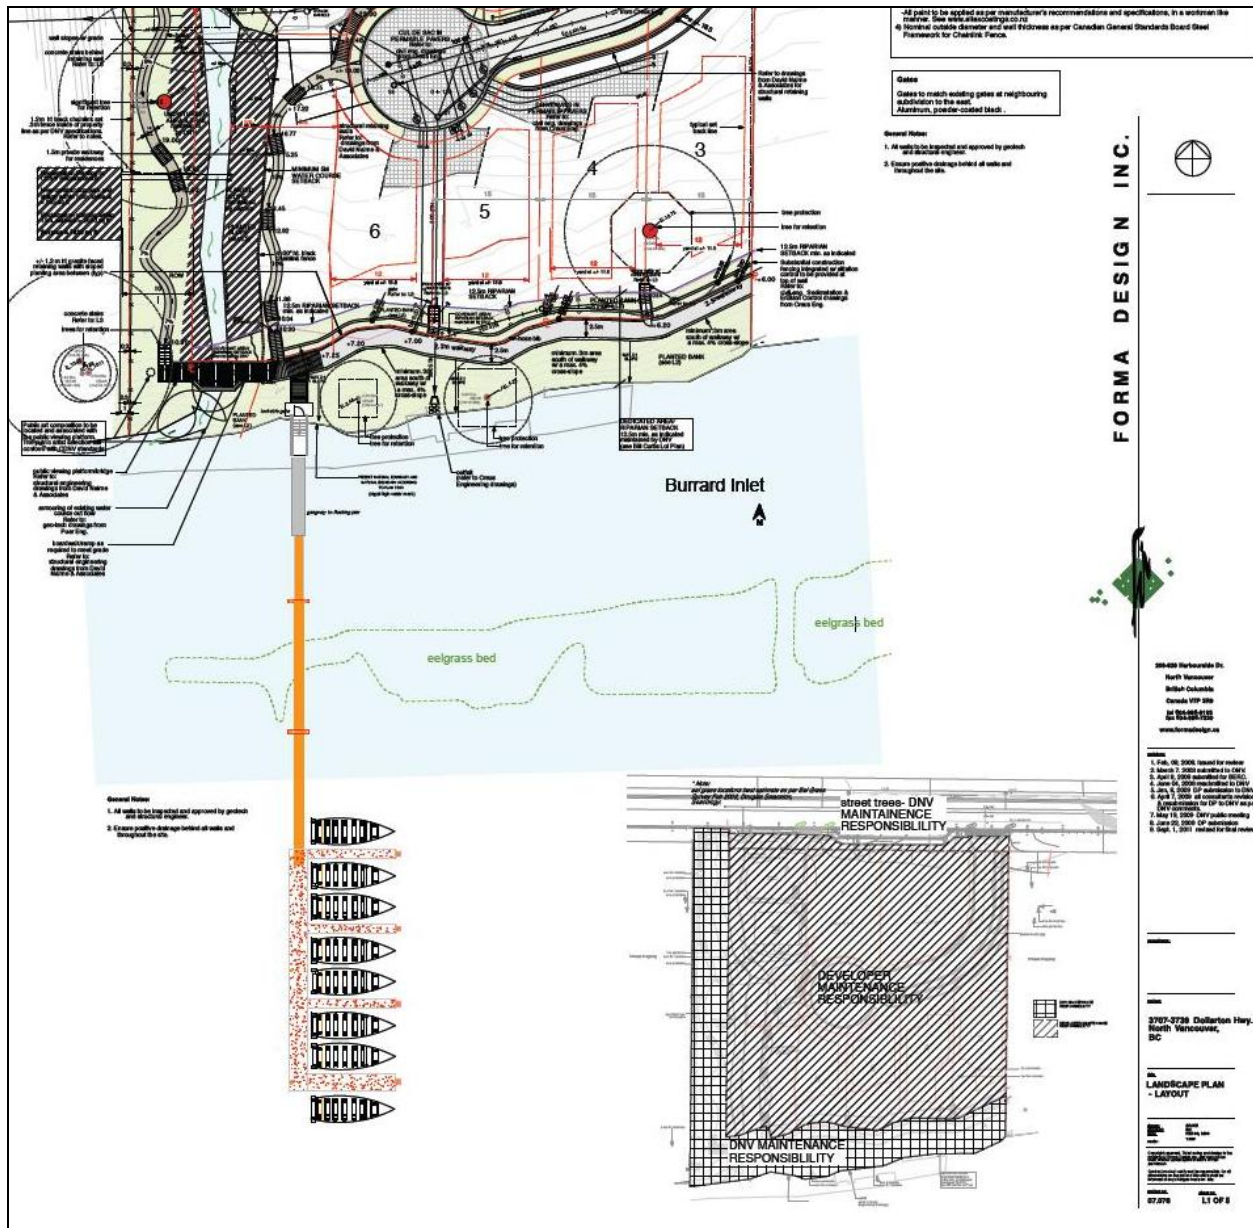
Map showing the configuration and location of the proposed dock at 3707 Dollarton Highway on the larger proposed development plan map.
